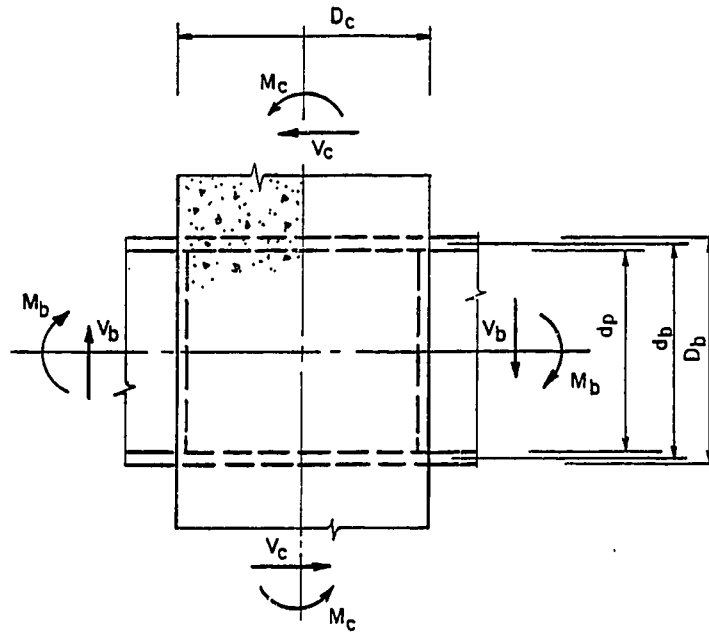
Forces on a steel beam-to-concrete column connection due to lateral loads.
